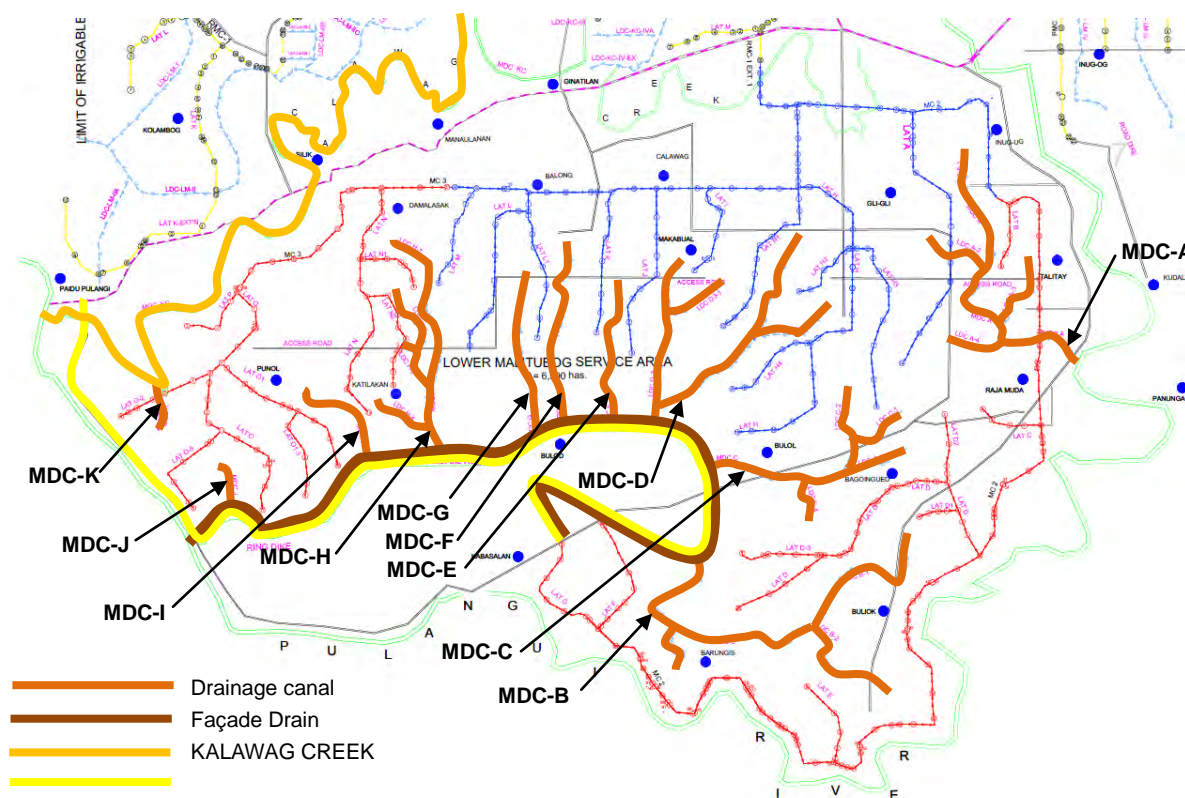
Plan of Drainage Canal System for LMSA
